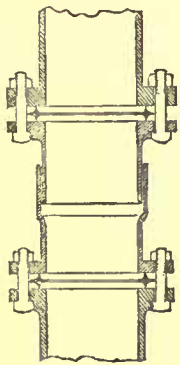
Insertion of a Fitting with Flanged Brass-Pipe.
